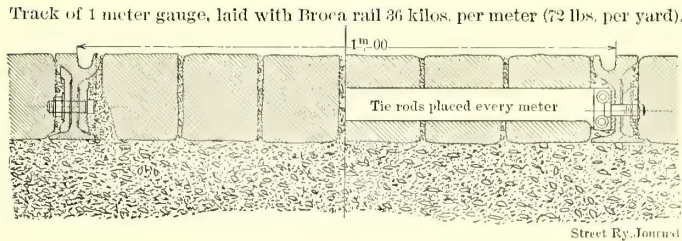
CROSS SECTION OF EARLY TRACK CONSTRUCTION
